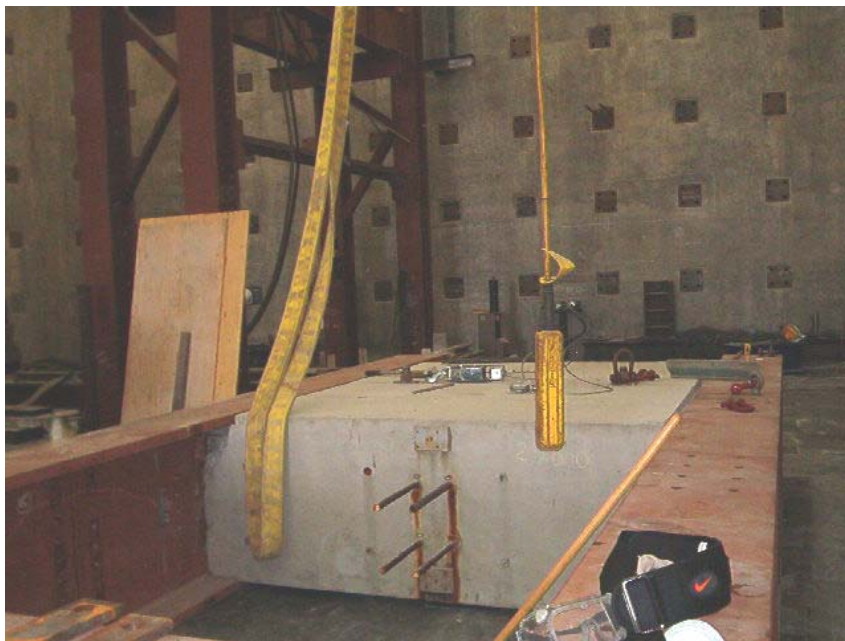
Reinforced concrete block wedged between the two W30x292 girders
